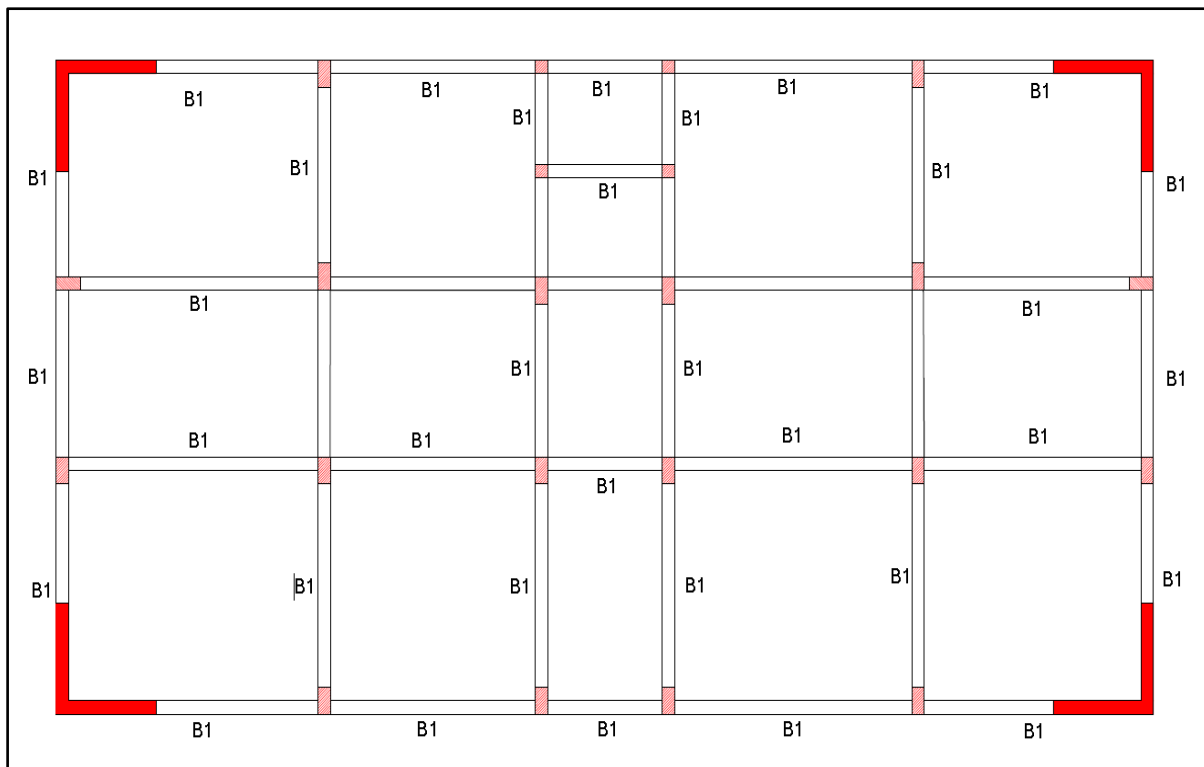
Shear Wall at Corner along Periphery of Structure in L Shape plan in AutoCAD
